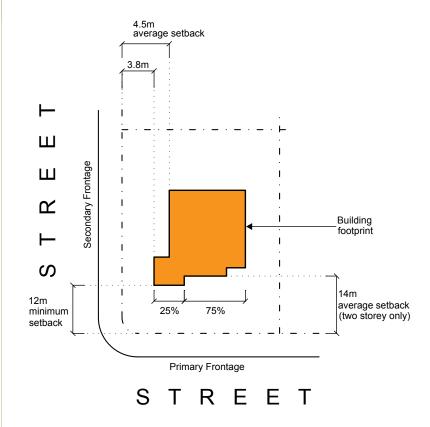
A.2-7: Setback for corner sites of a two story house on the high side of the street
